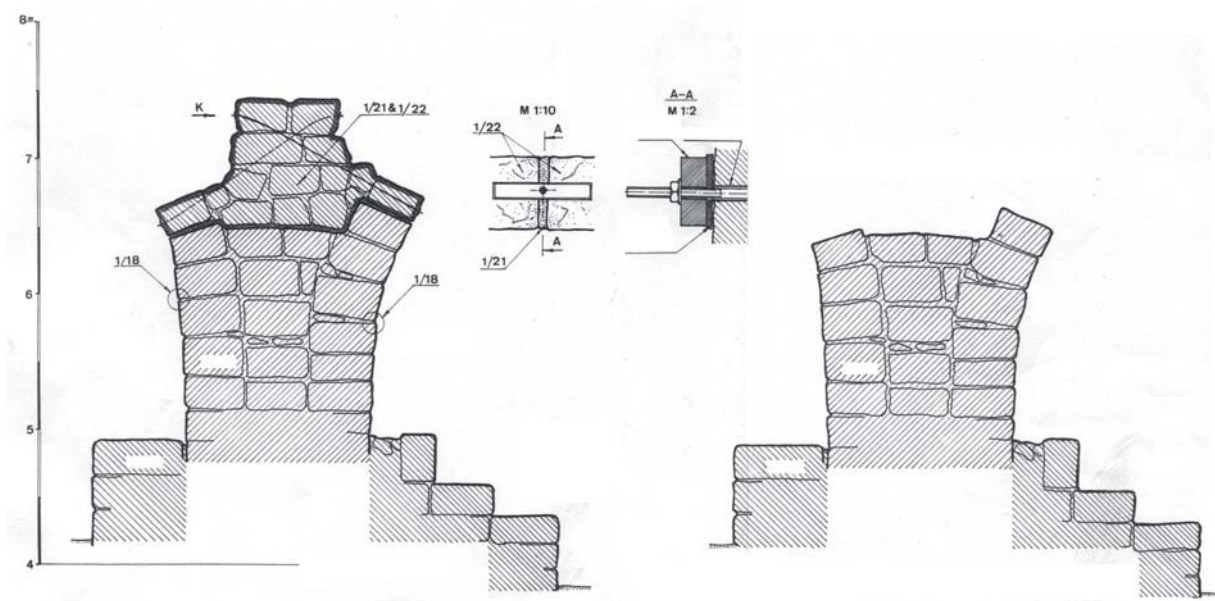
Bracing. South Wall, Between Vaults 1-2. West End. Facing East. (Eng. Lilya Suchanov, IAA)
